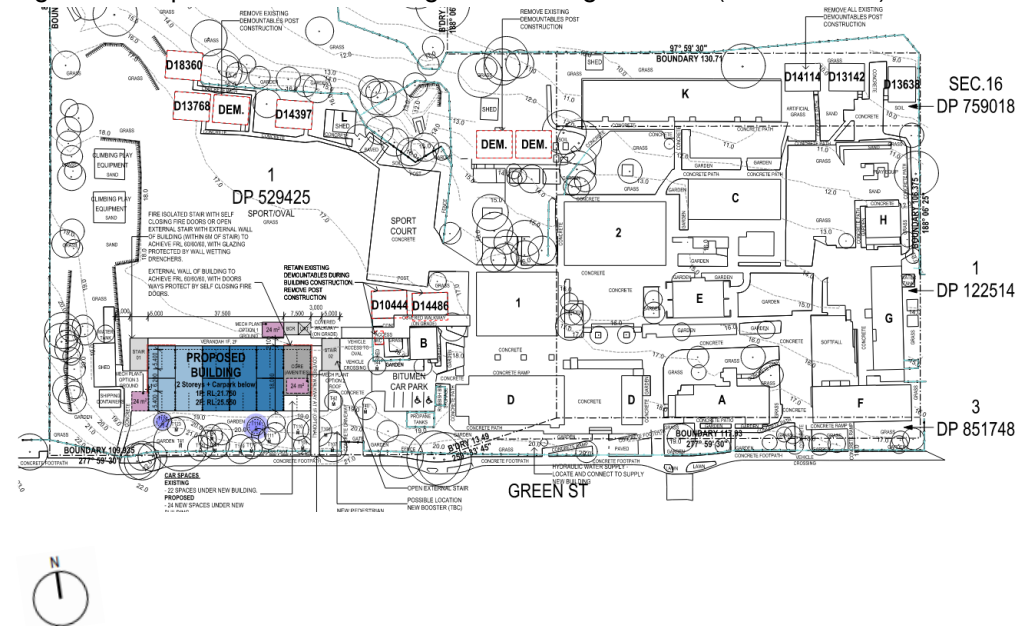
Option 2 – New Building over existing Car Park (Indicative Plan)
